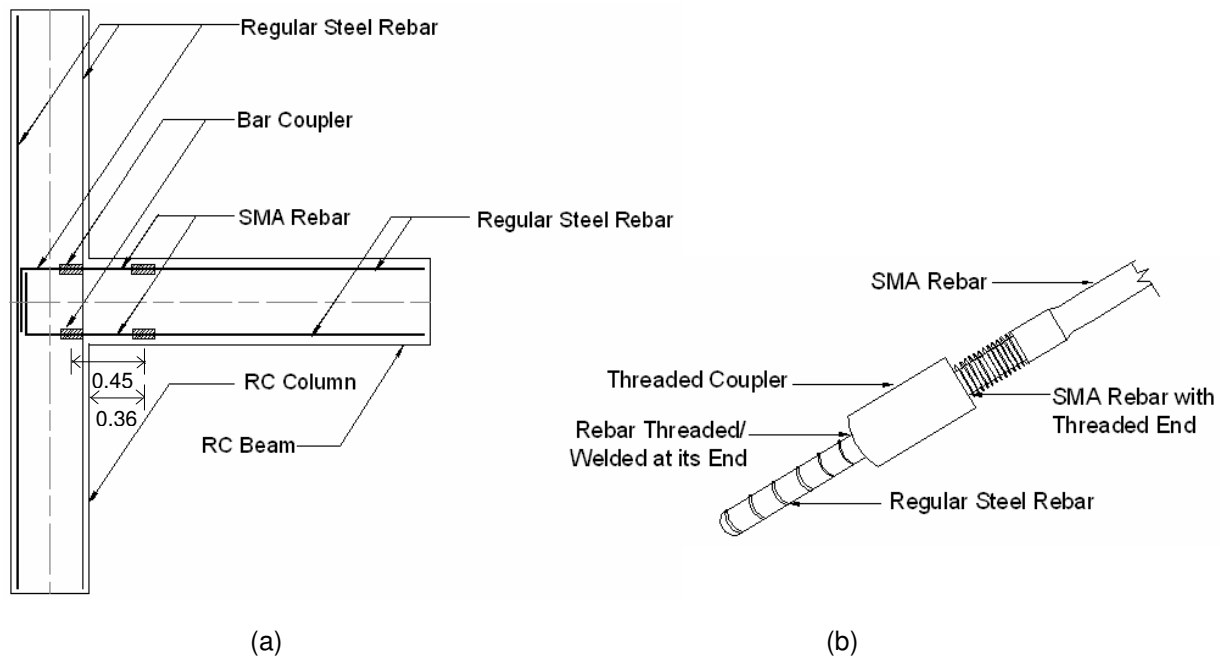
(a) Splice details of specimen JBC-2, (b) threaded mechanical coupler connecting SMA rebar with regular steel rebar (all dimensions in m).
